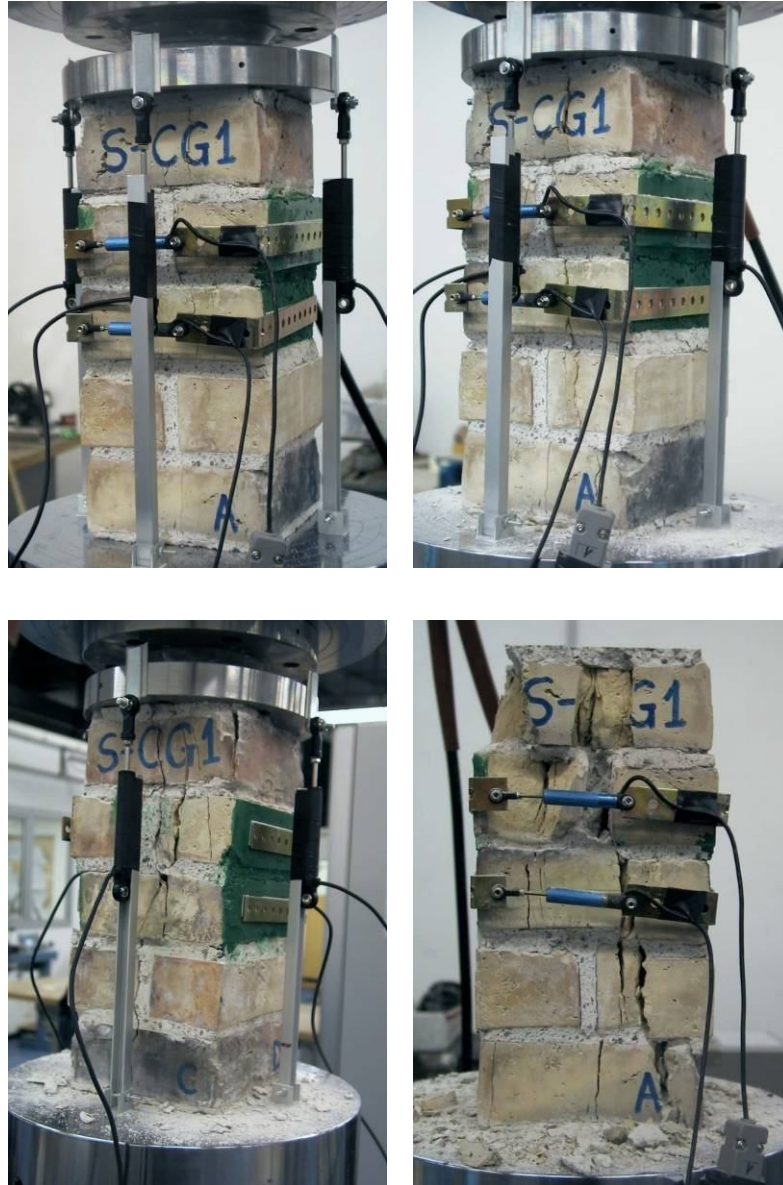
Failure pattern of historic brick masonry under centered compression: S-CG specimens.
